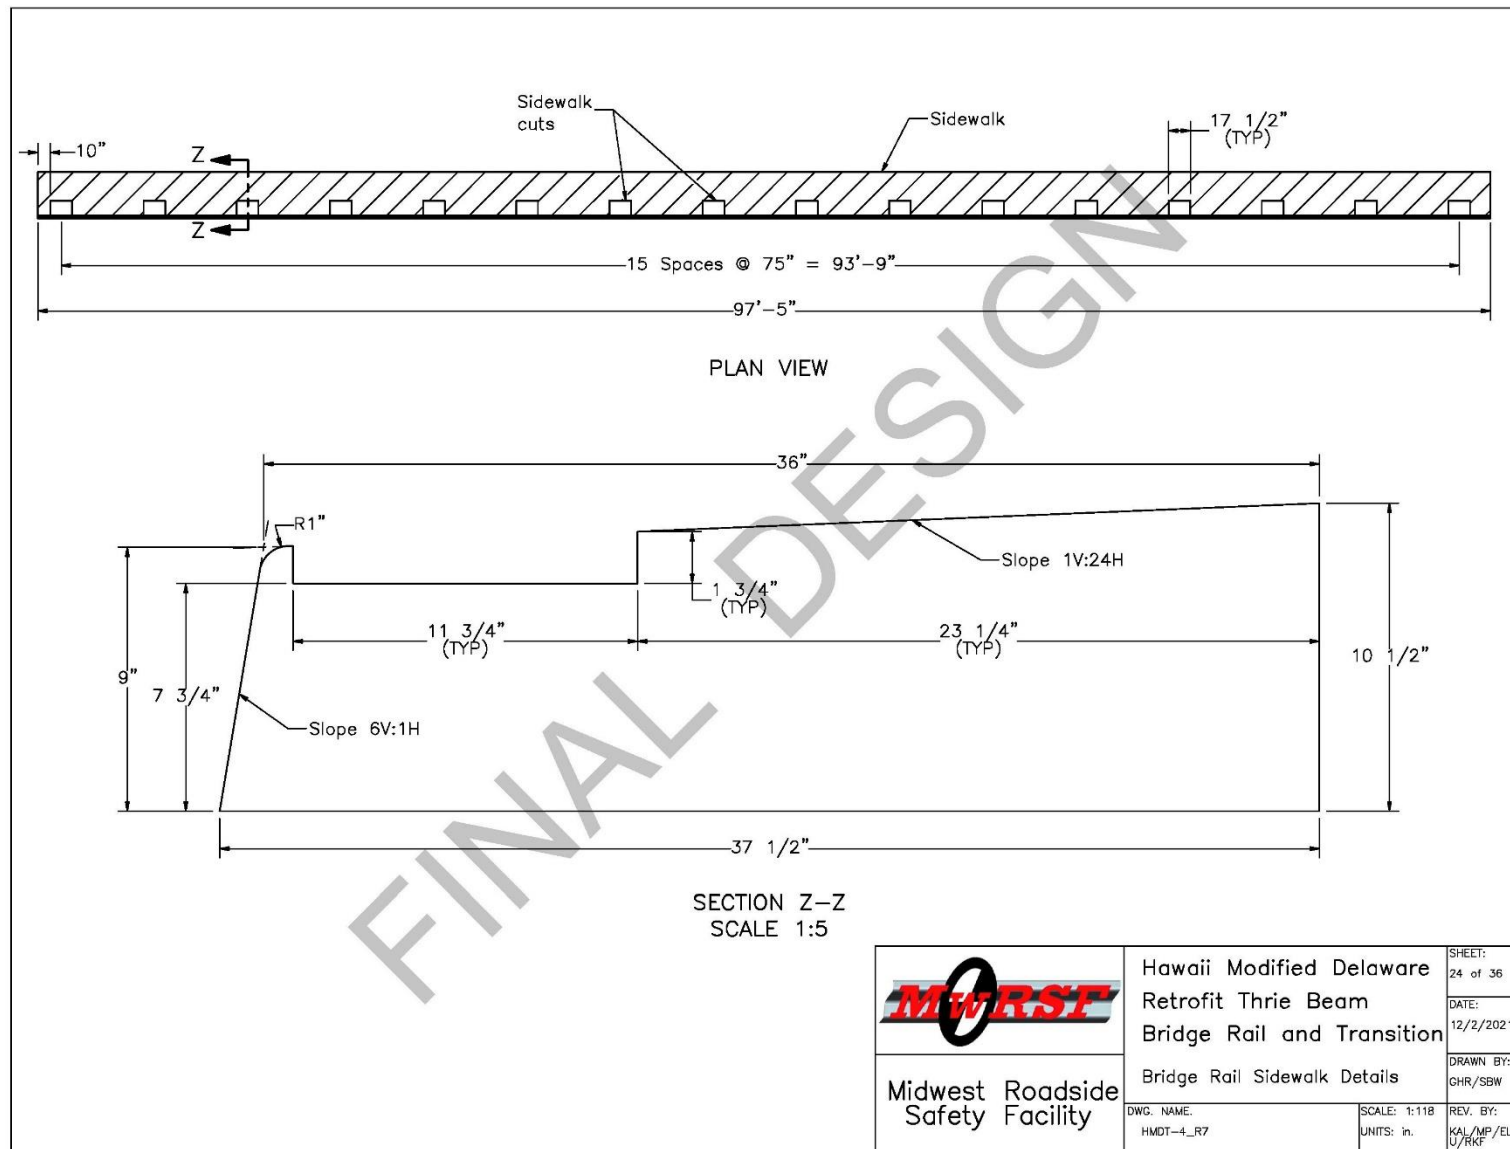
Bridge Rail Sidewalk Details, Test No. HMDT-4
